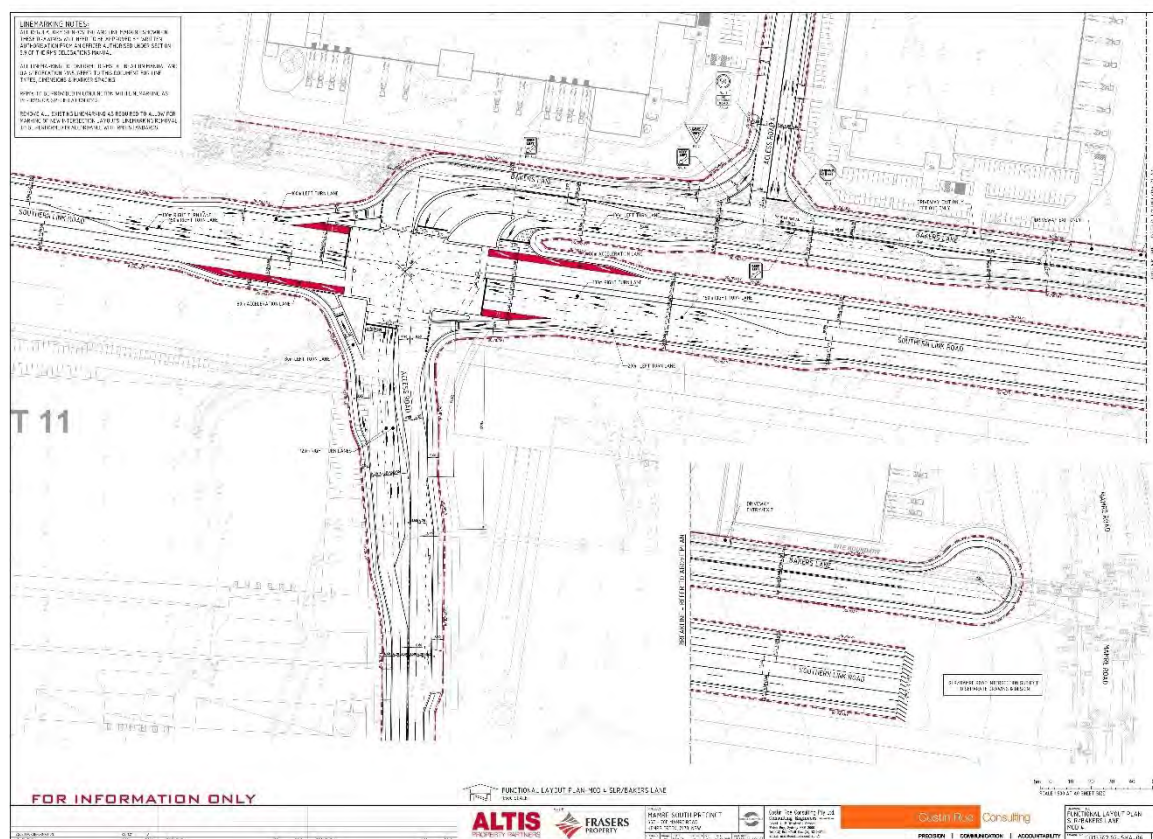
Bakers Lane and New Access Road Intersection Arrangement
